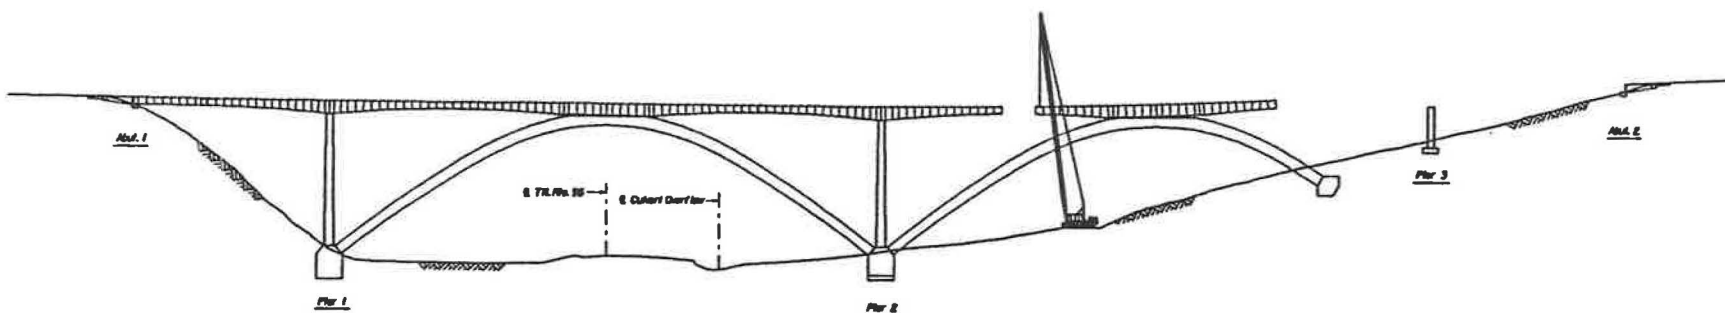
Superstructure construction - precast alternate - phases 1 and 2
